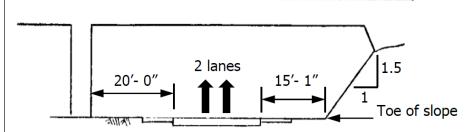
Bridge elevation view of horizontal clearances for a 2-lane highway feature with 1-way traffic below the bridge.
